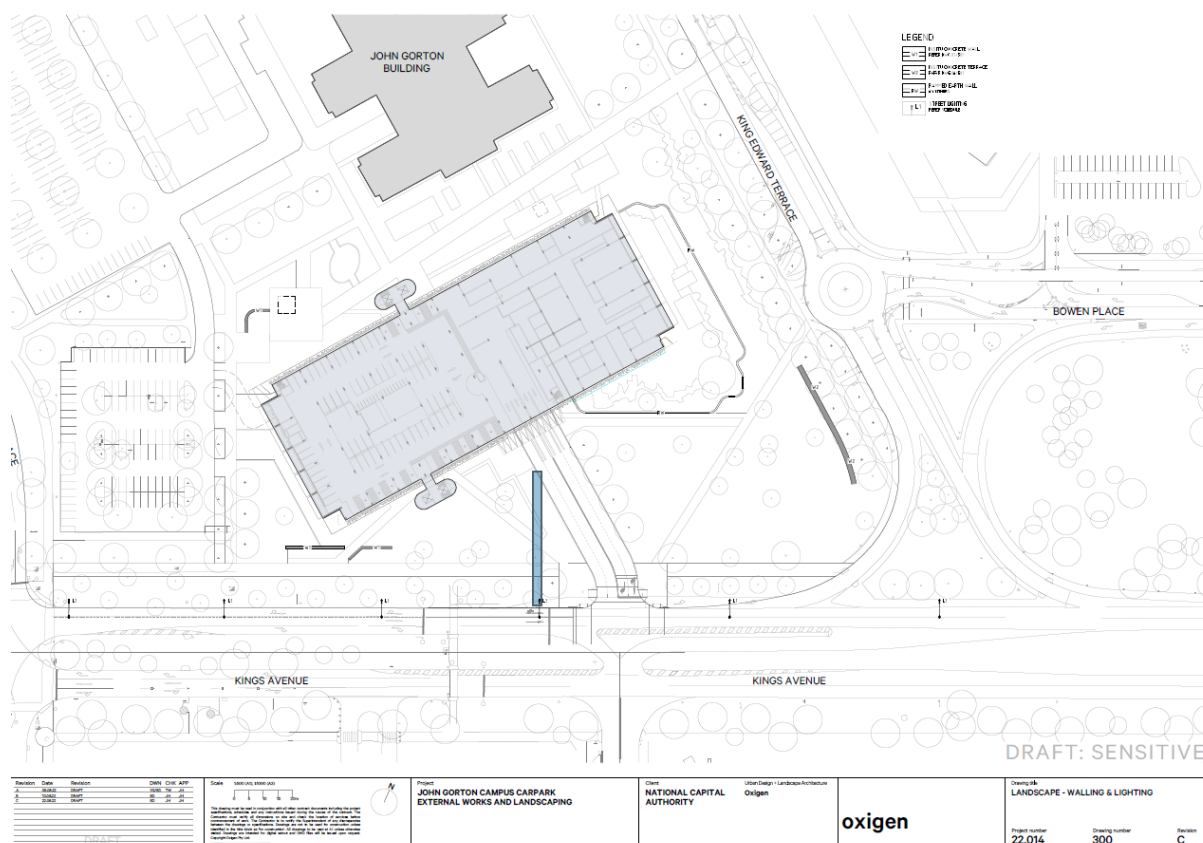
Drawing showing the siting of the proposed building. The 20m scale on the drawing shows that the proposed new building is approximately 30 meters from the edge of the John Gorton Building (Source: BVN, Presentation to DAWE October 2021).
